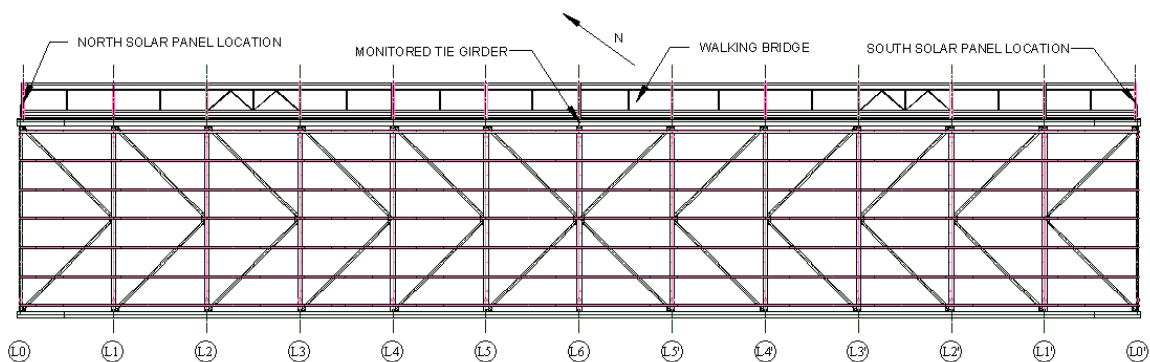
Walking bridge adjacent to monitored tie girder plan view
